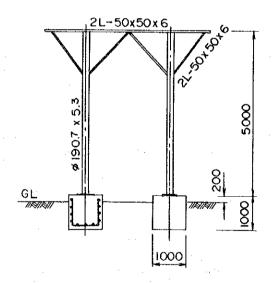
SUPPORT STRUCTURE for INSTALLATIONS at SHARPEVALE SUBSTATION
